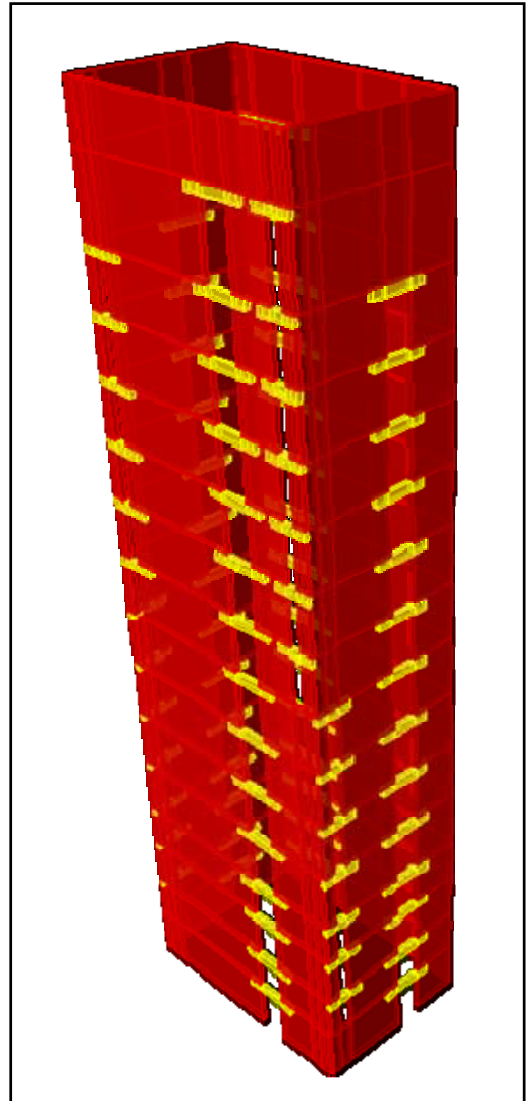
Shear walls and coupling beams modeled in ETabs
